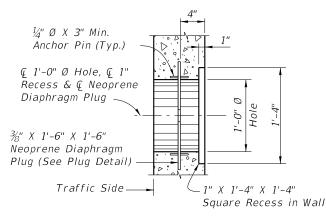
DETAIL "B" - SECTION AT INTERMEDIATE OPEN JOINT
